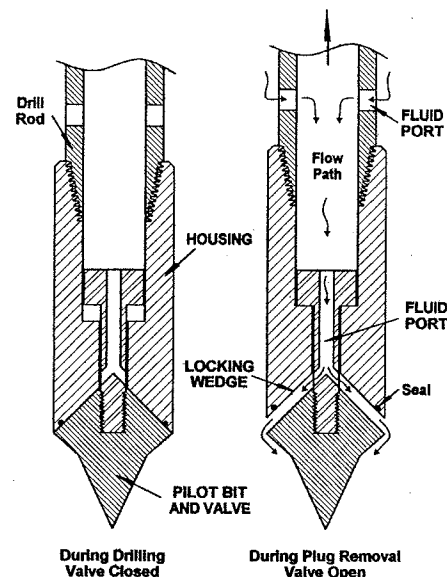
Special plug for lower end of auger assembly (patents pending). The plug remains fixed at the bottom of the auger assembly during drilling and rotates with the assembly.
